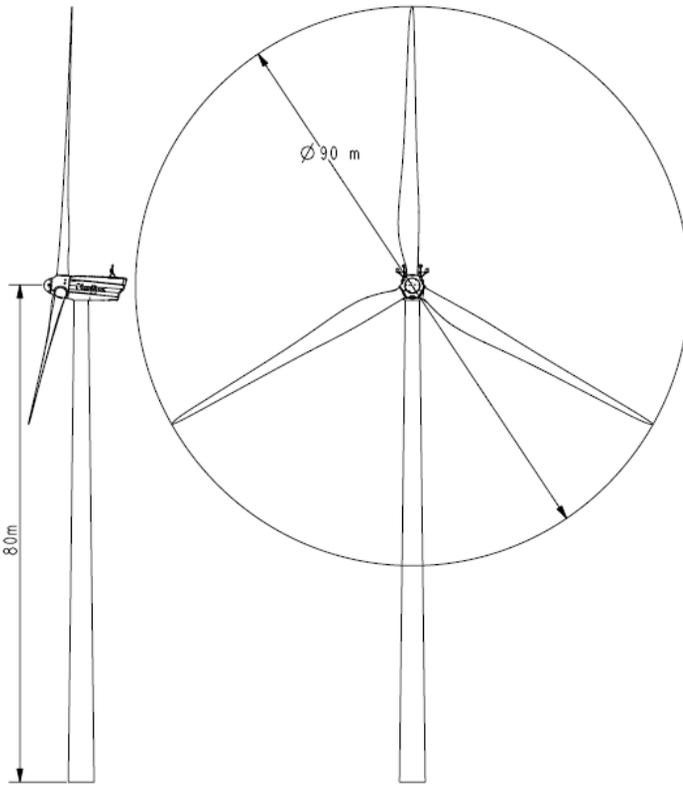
Front and side elevation of a three bladed horizontal wind turbine^[2]
